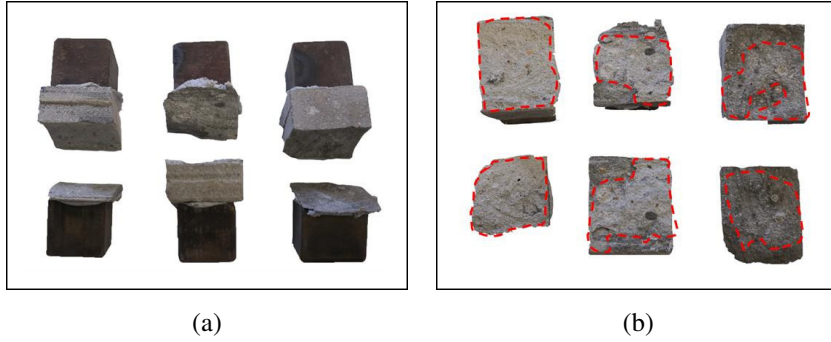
Failure patterns and fracture planes of 3D printed samples in the pull-off test: (a) side view and (b) red area indicates the light grey zone.
